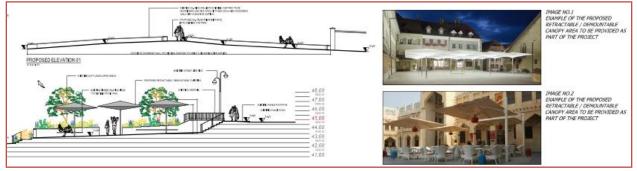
Elevational plans of the new wall to the town car park which will be reconstructed at a height to allow informal seating, improved visibility and passive supervision. Cross-sectional detail of the proposed retractable canopies in the Diamond Civic Space.
